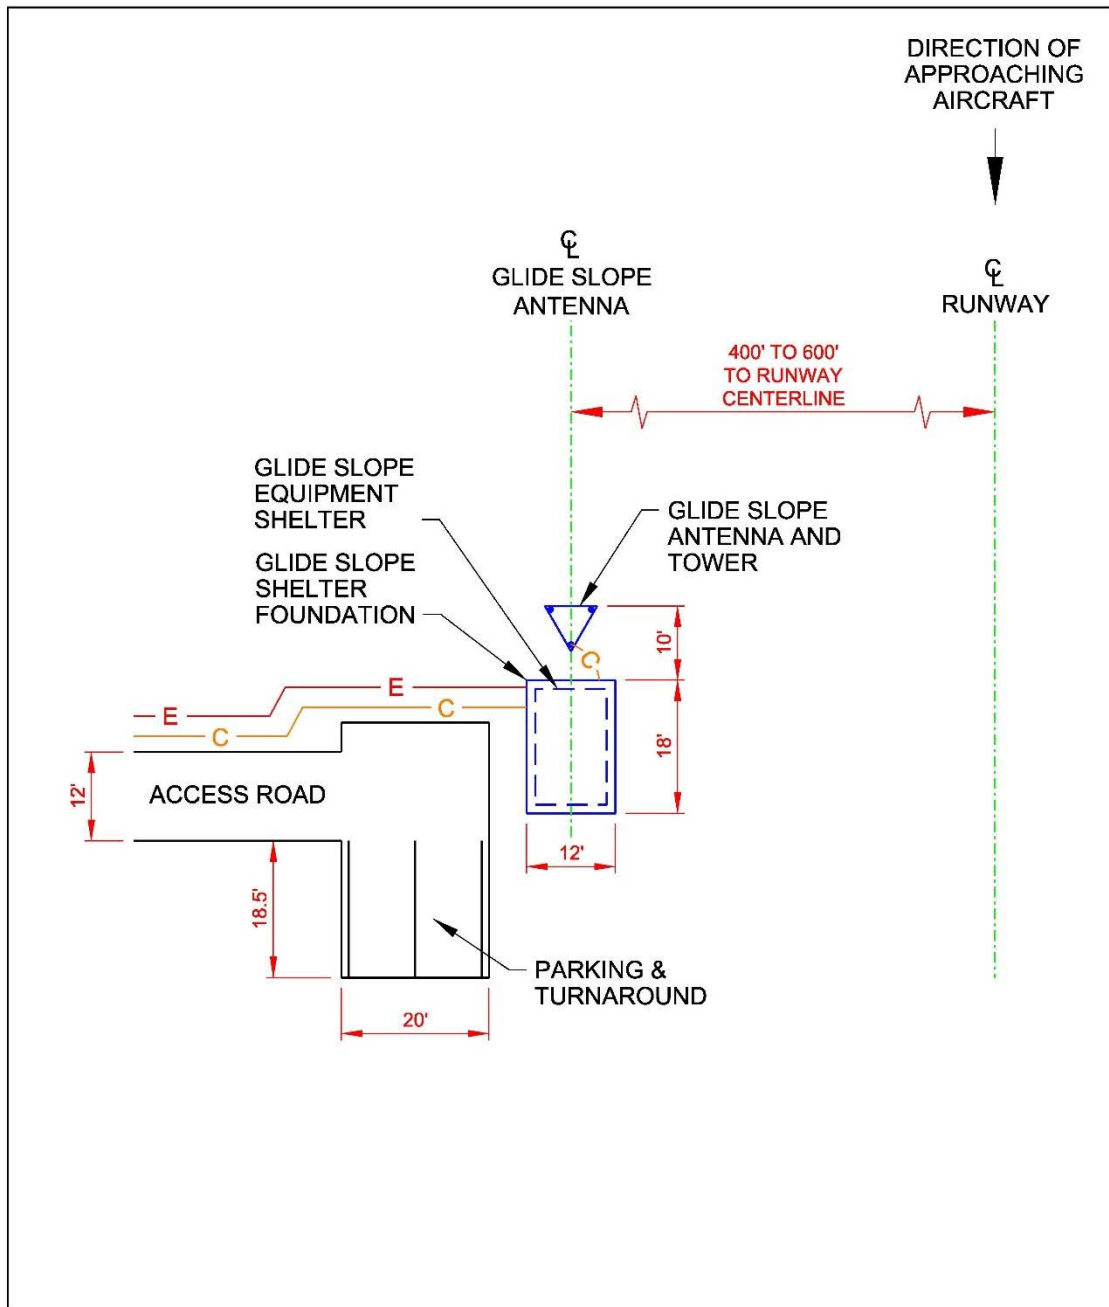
ILS Glide Slope Equipment and Antenna Site Plan
